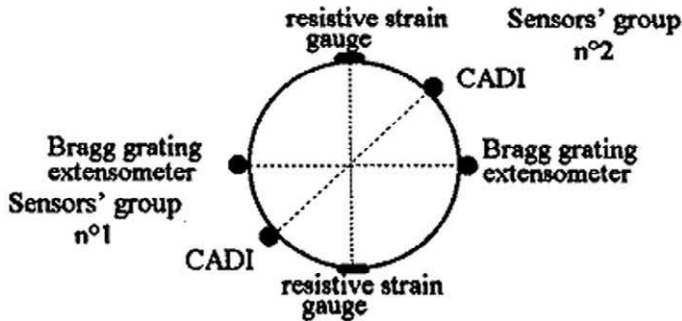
Siting of two Bragg grating extensometers and other sensors around a concrete column that was axial loaded. From DeWynter-Marty, V., Rougeault, S., Ferdinand, P., (1997), "Concrete Strain Measurements and Crack Detection with Surface-Mounted and Embedded Bragg Grating Extensometers," OSA 12th Int. Conf. on Optical Fiber Sensors, Williamsburg, 600–603.
